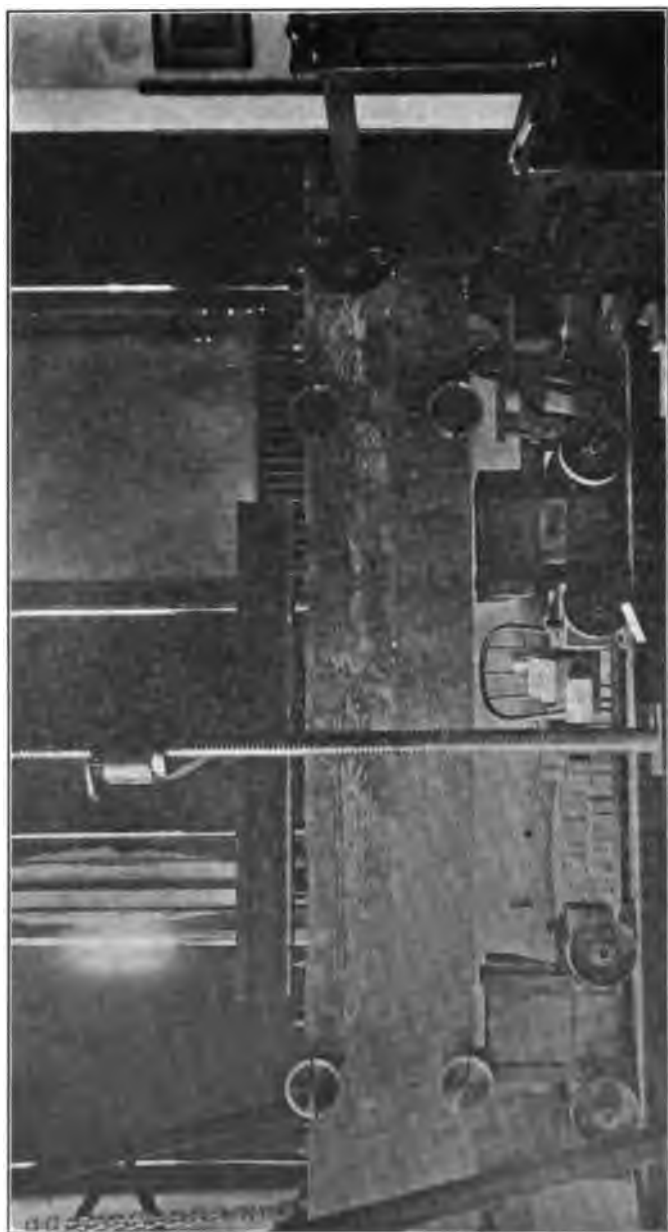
PLATE V.—BEAM WITH STIRRUP DEFORMATION APPARATUS.
